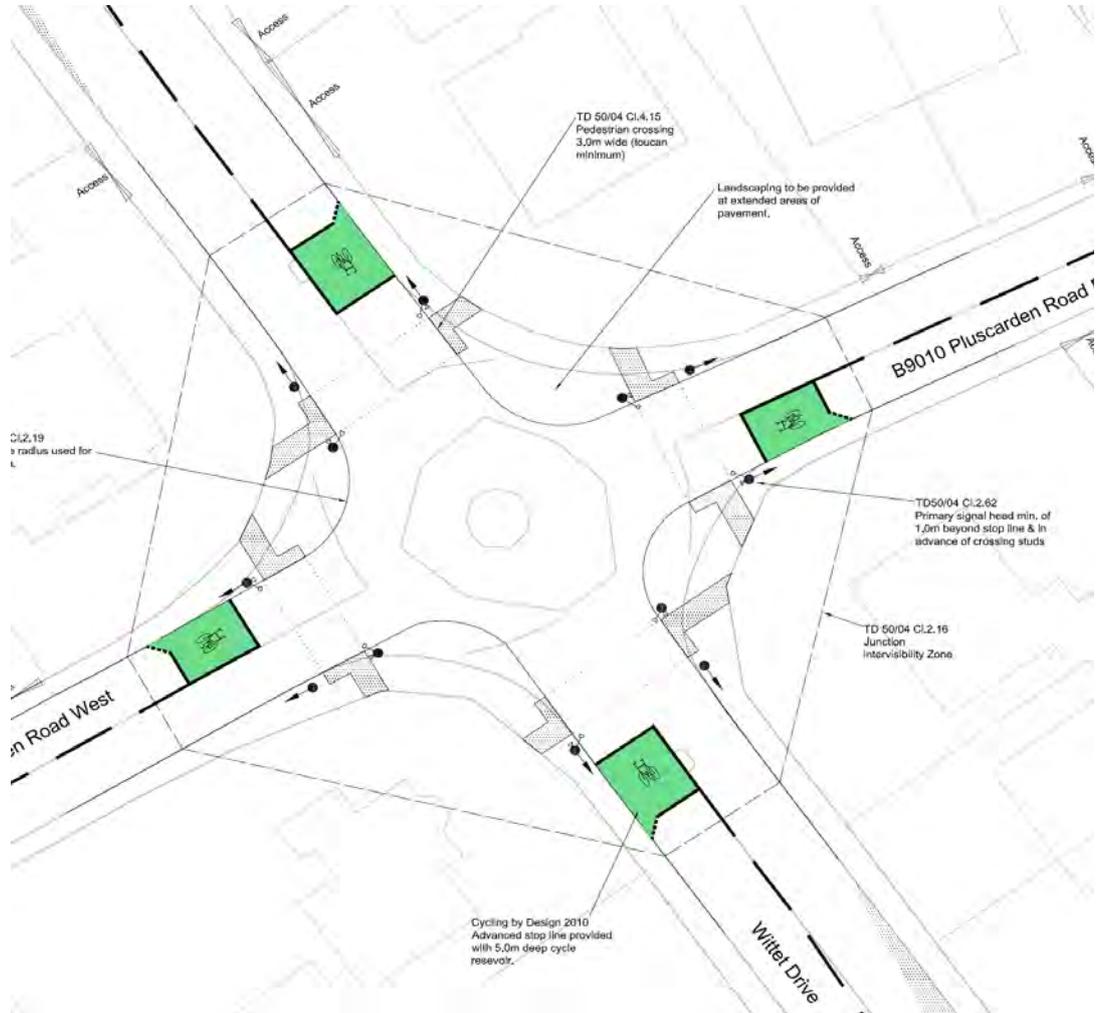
B9010 Pluscarden Road Junction: Traffic Signal Layout
